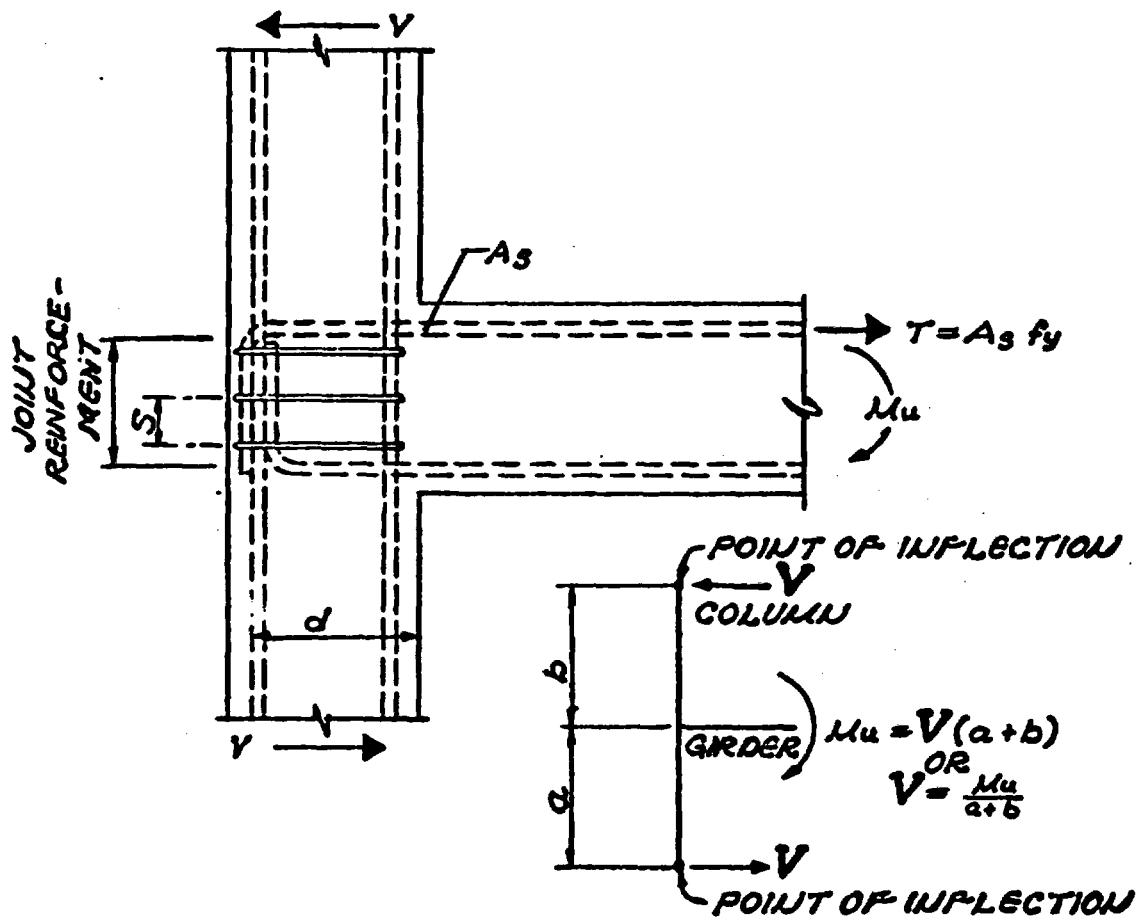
Concrete Frame Type A - Column Transverse Reinforcement
